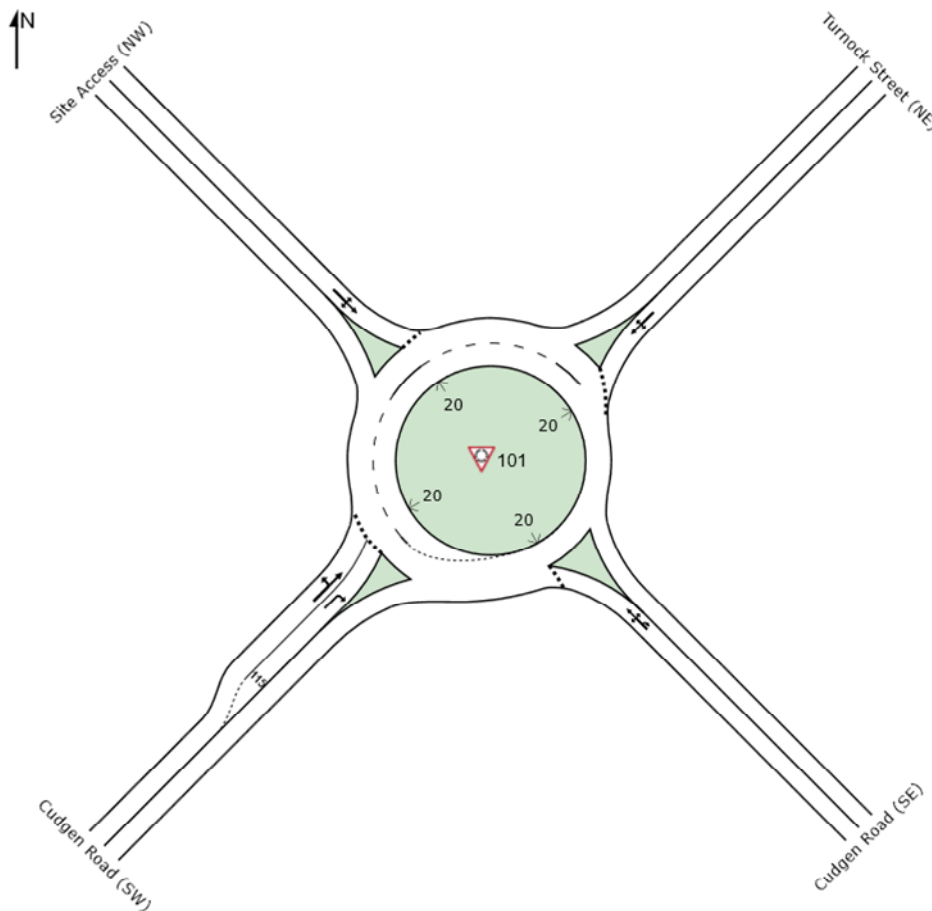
Cudgen Road / Turnock Street SIDRA Intersection Layout (With Access)
